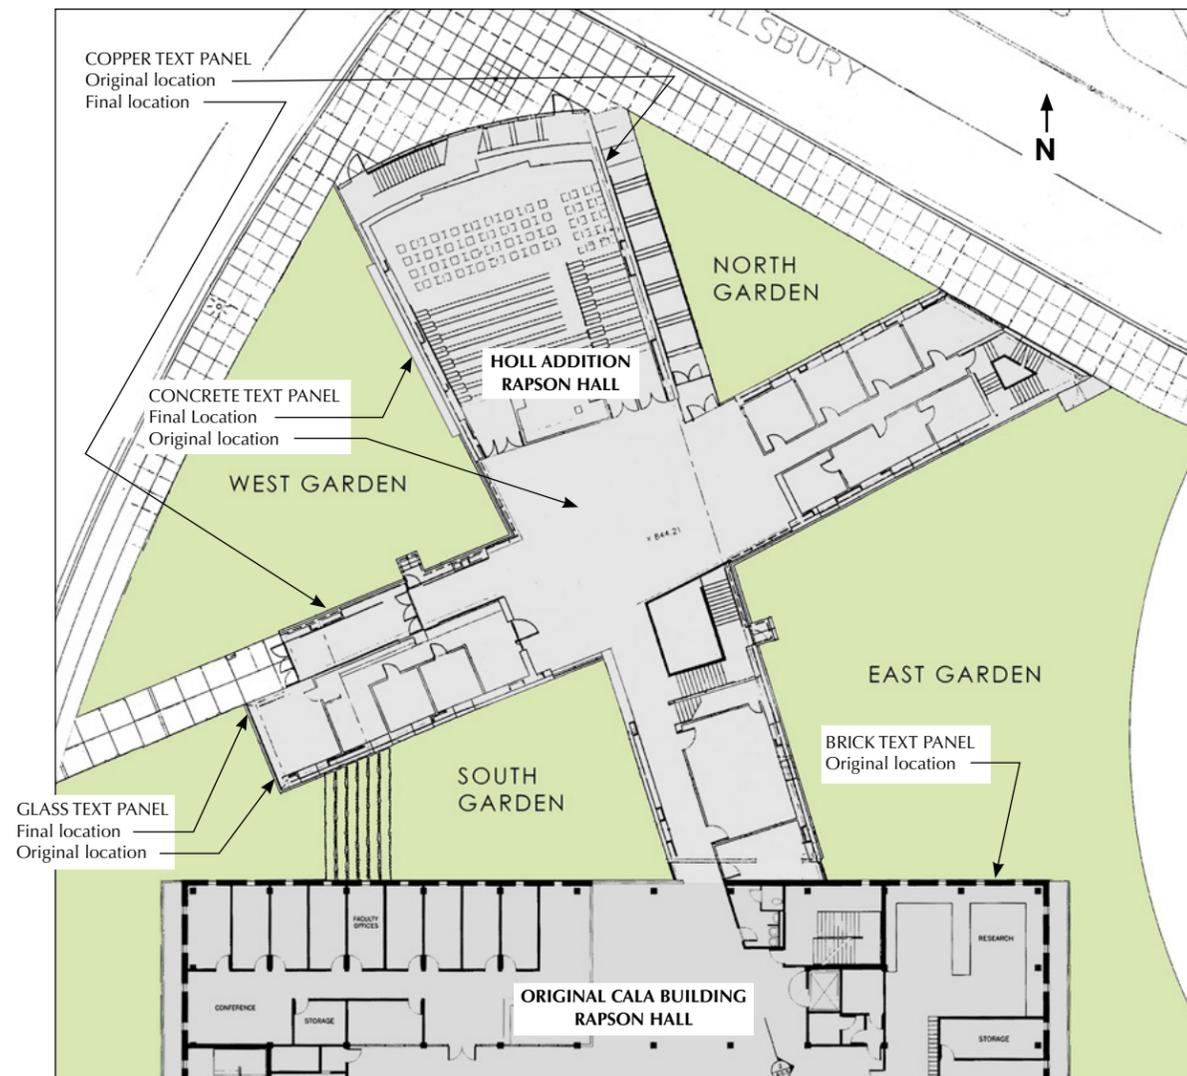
Rapson Hall Annex, designed by Stephen Holl, plan view, showing initial and final location of *Rapson Group/Geology Text Panels*, north end of Rapson Hall. Computer graphic by John Roloff on architectural site plan by Steven Holl Architects,
